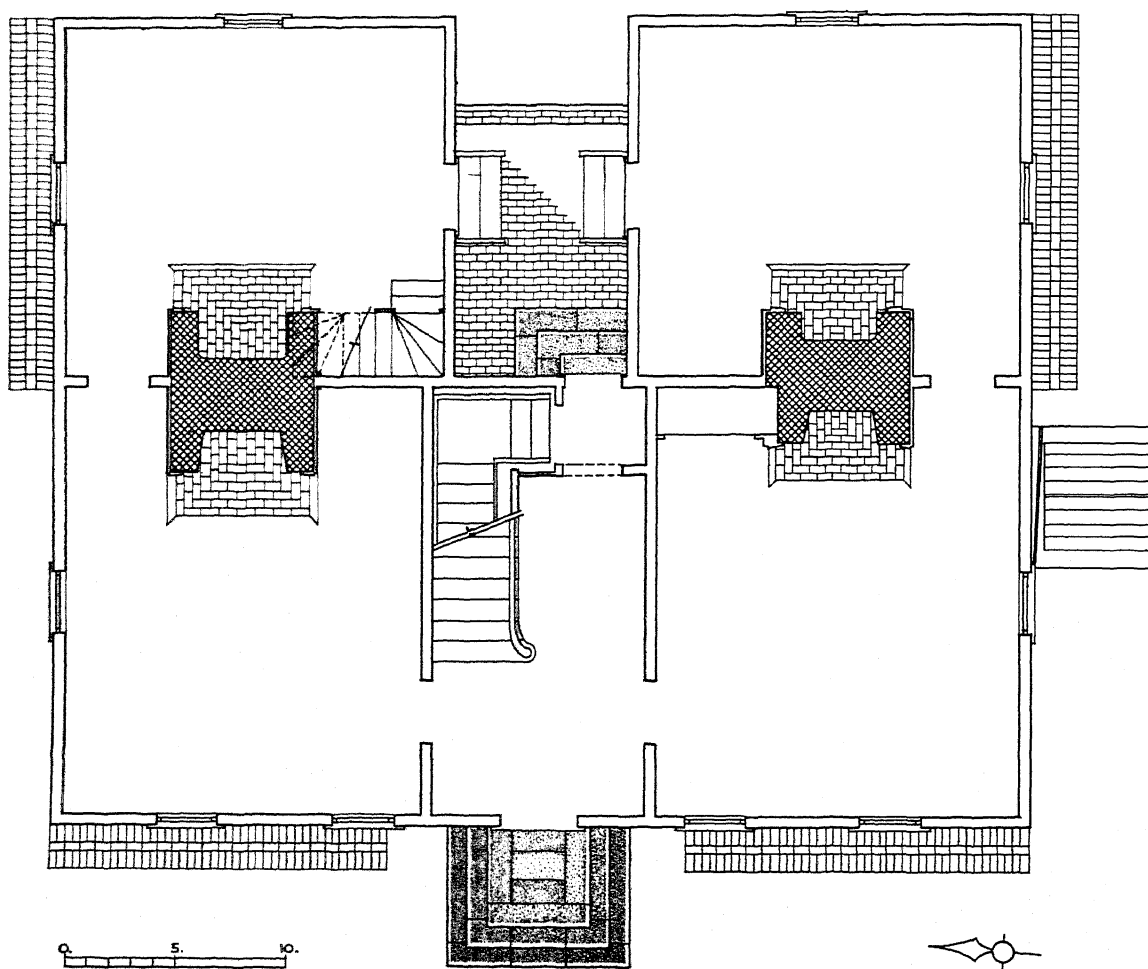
THE BRUSH-EVERARD HOUSE. Plan.
